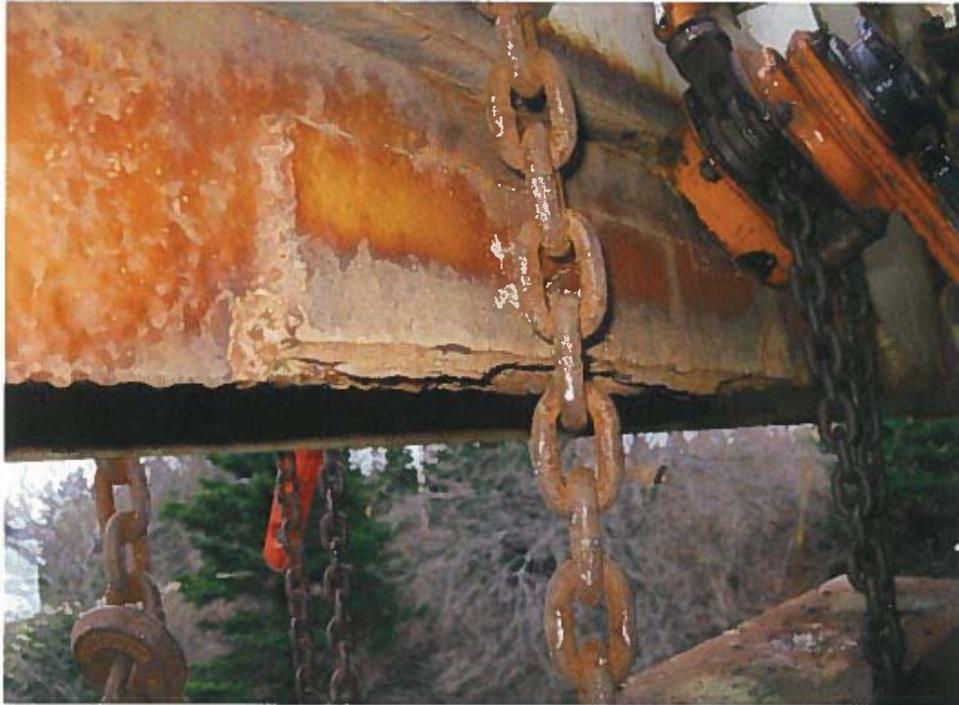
Section loss and perforation at gusset plate location at north truss panel point 2W
